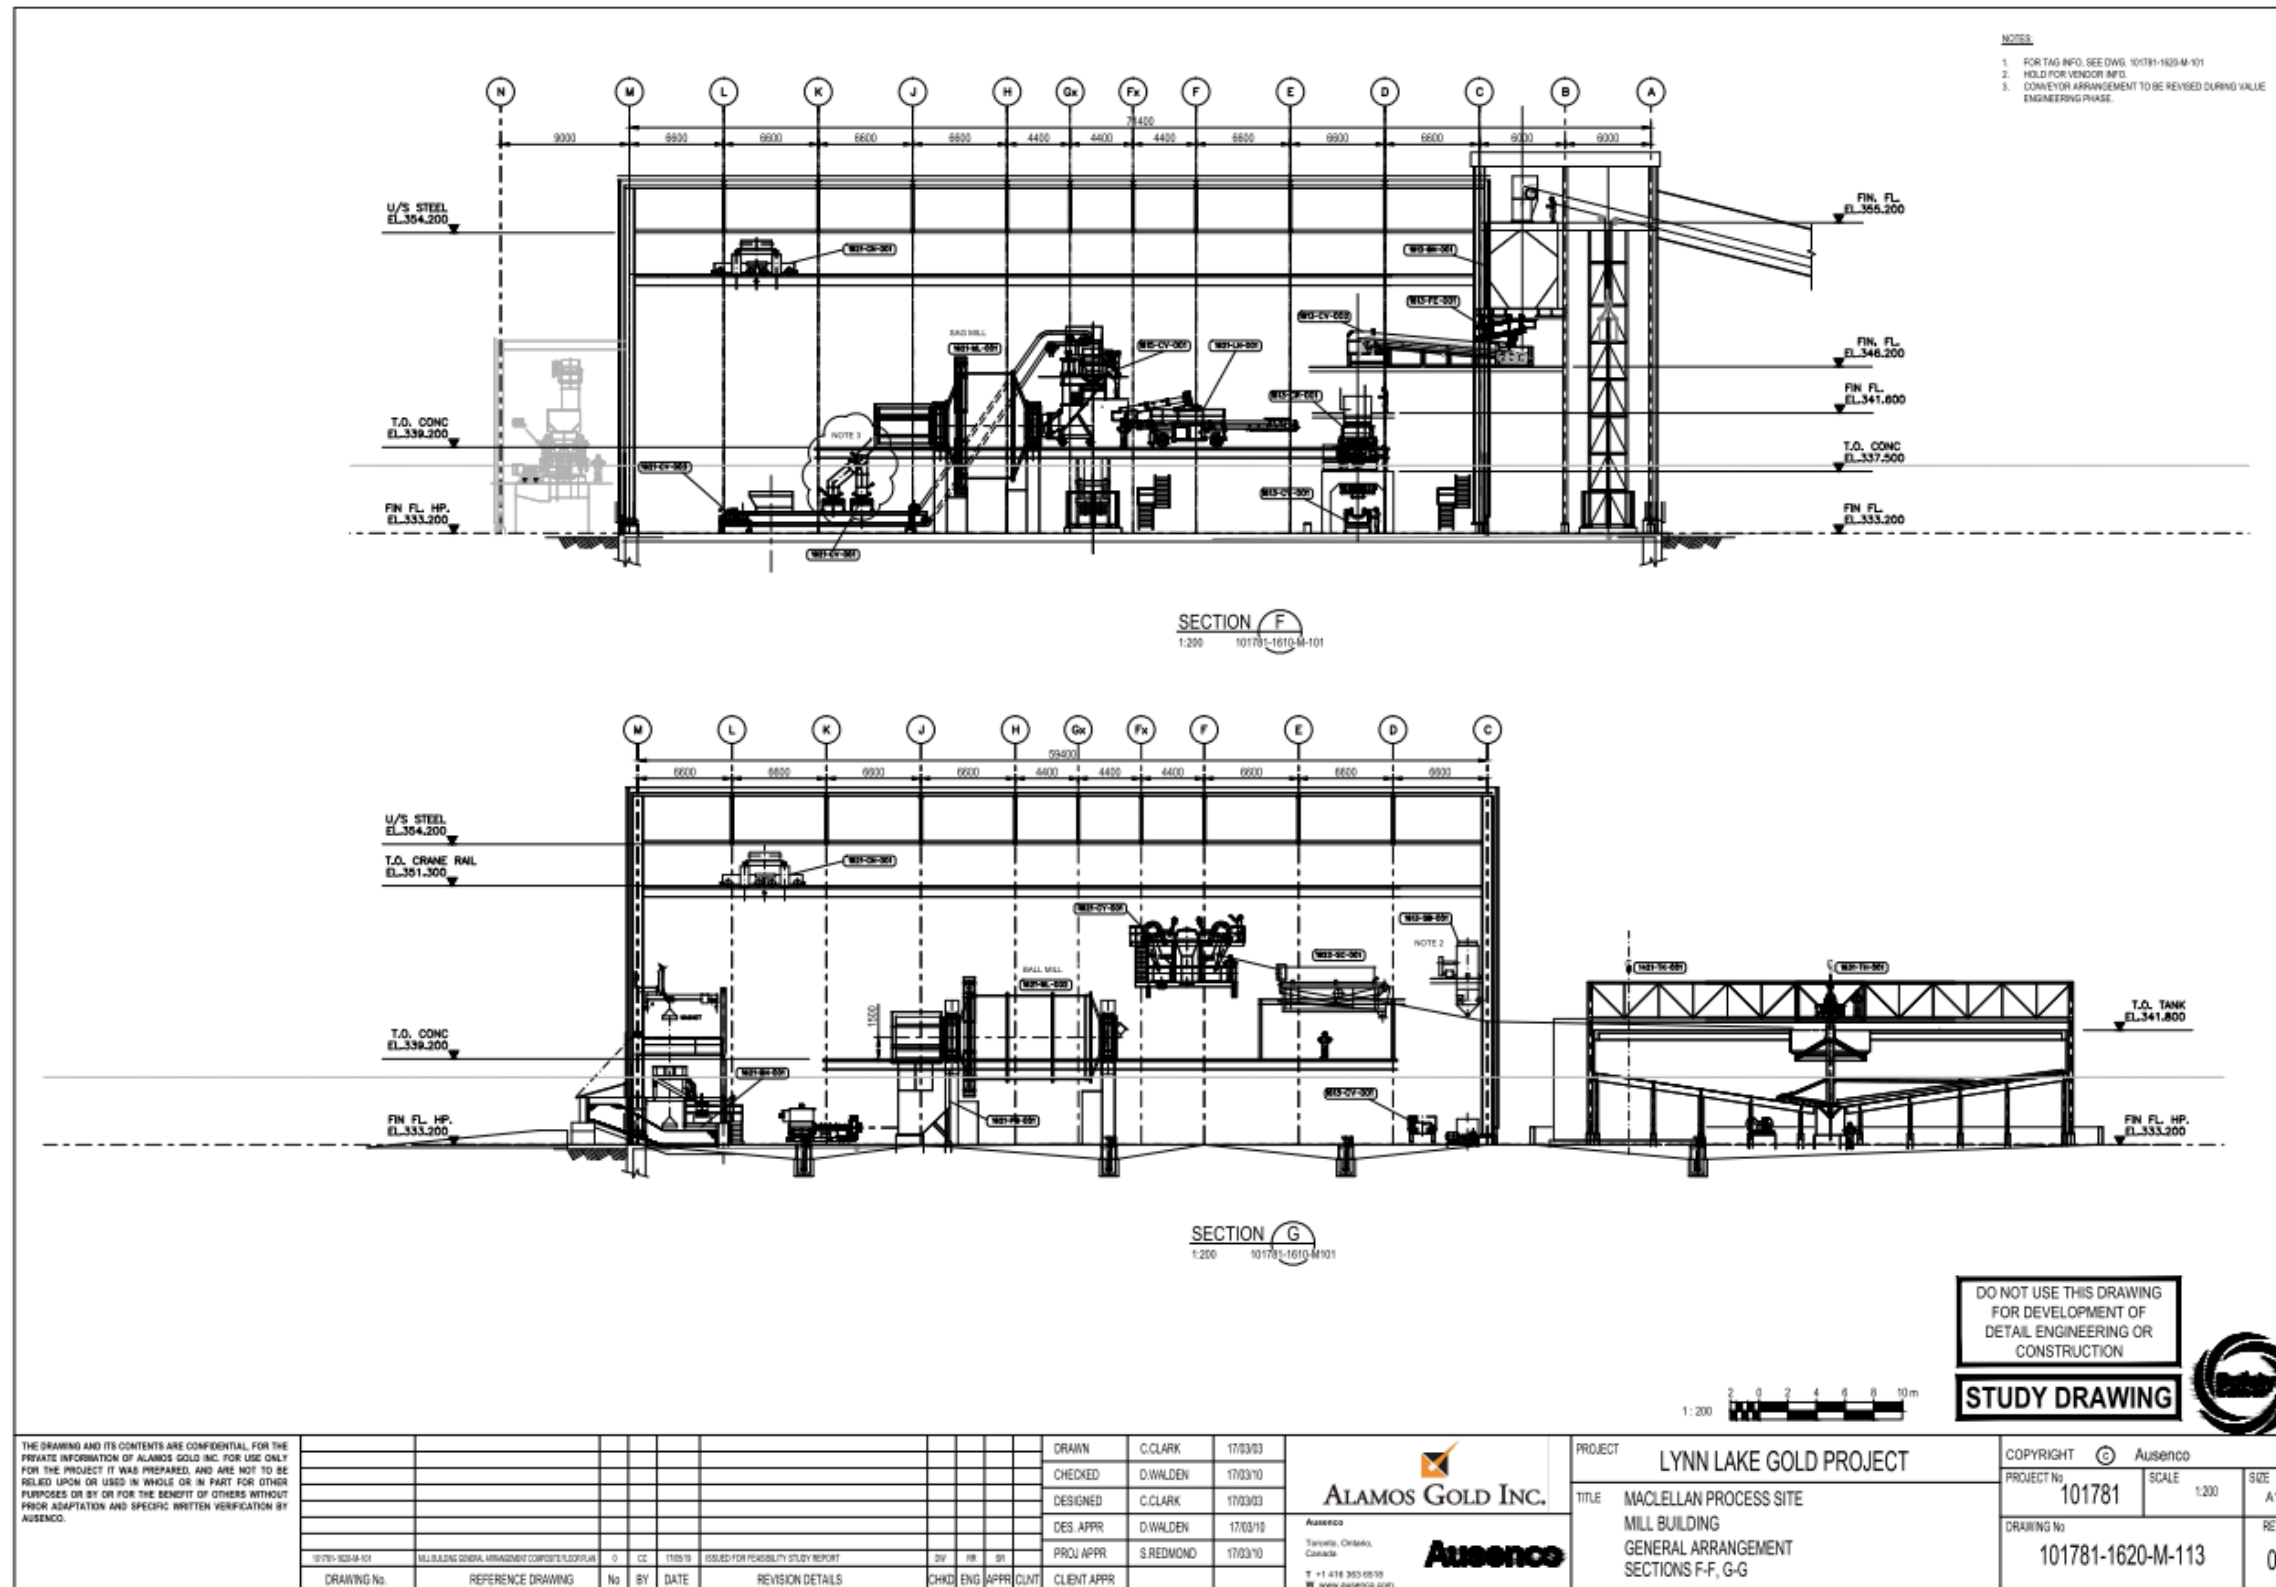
MacLellan Mill Building General Arrangement, F-F and G-G
